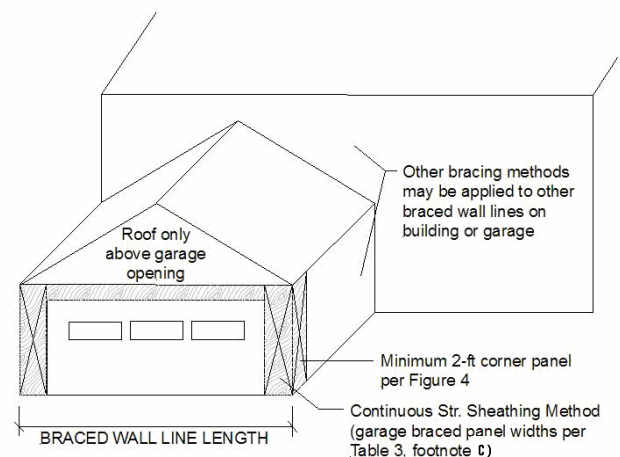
Garage Opening Wall per Table 3, footnote c (IRC Table R602.10.5).
